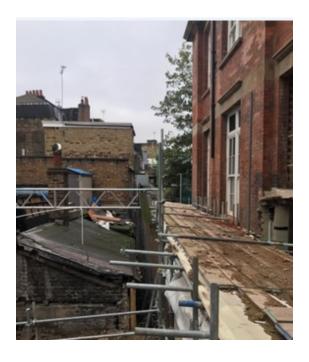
Site viewed from the north looking onto the flat roof of the King's Head
